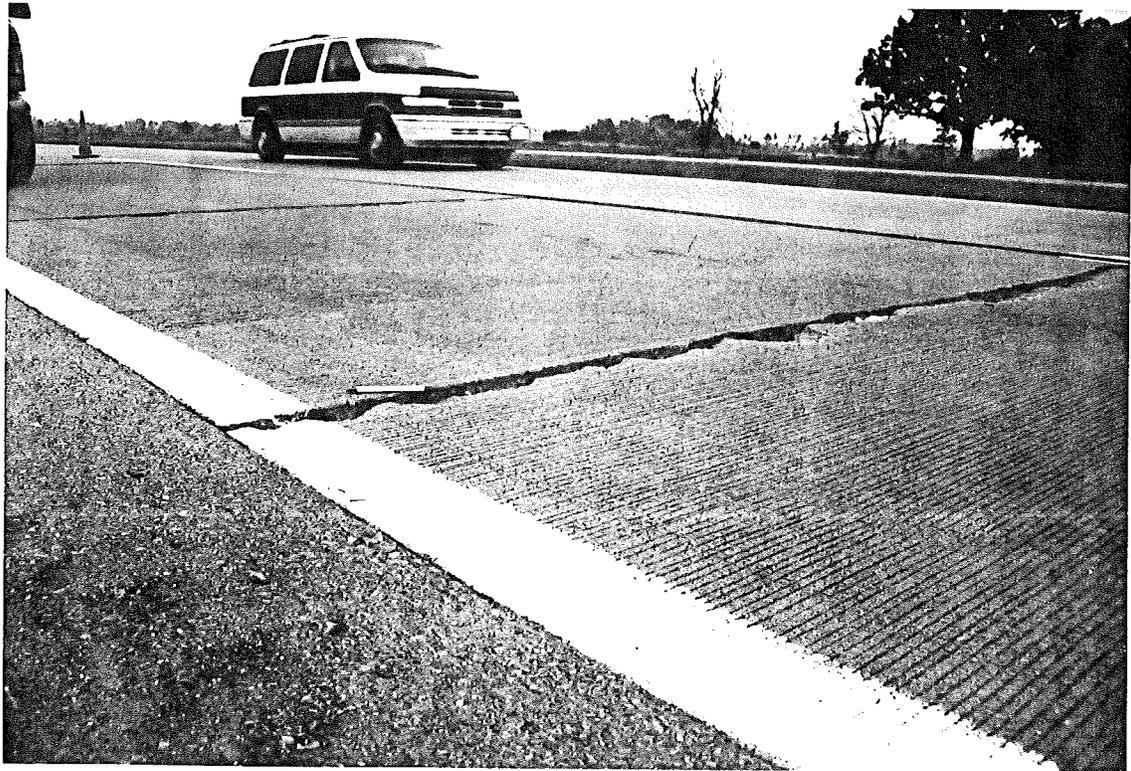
A severely spalled and faulted transverse crack in CSN# 77024-20821A (Section A), EB.
